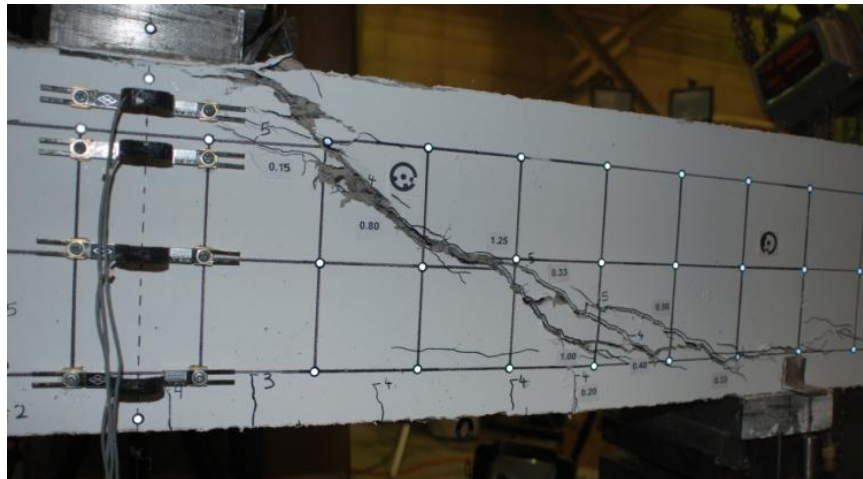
Overall Failure Crack on South Face of S300-B1
